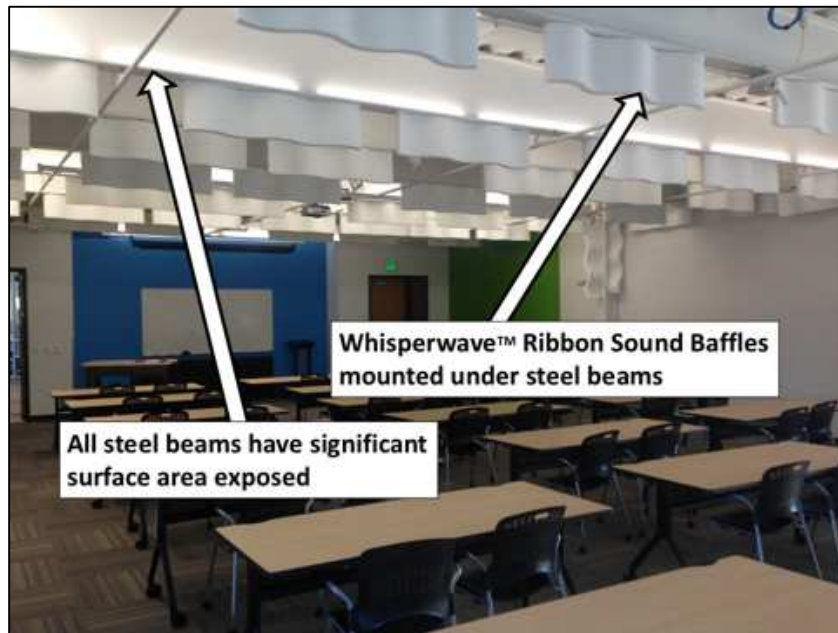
First floor classroom original condition. Whisperwave™ Ribbon Sound Baffles had been installed under the steel beams, but nearly all steel in the room remains exposed and available to reflect noise.
